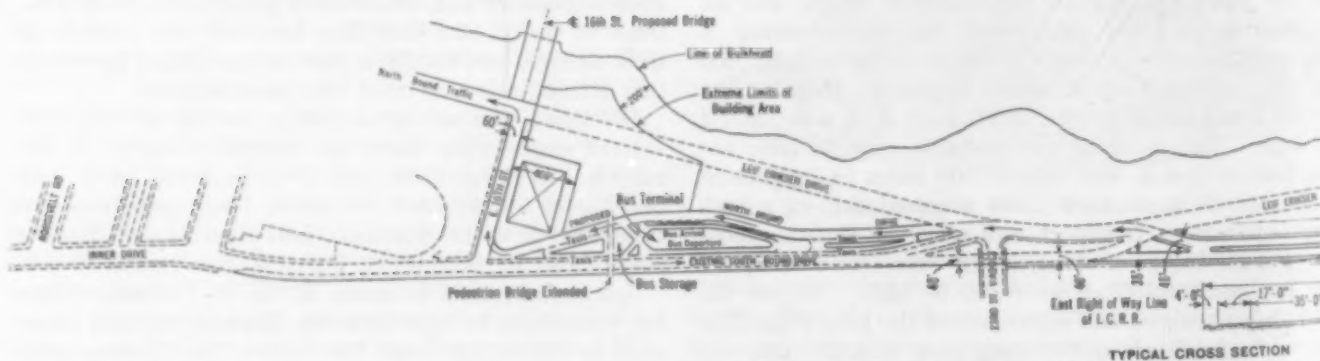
ROAD CONSTRUCTION PLAN, "A CENTURY OF PROGRESS,"
